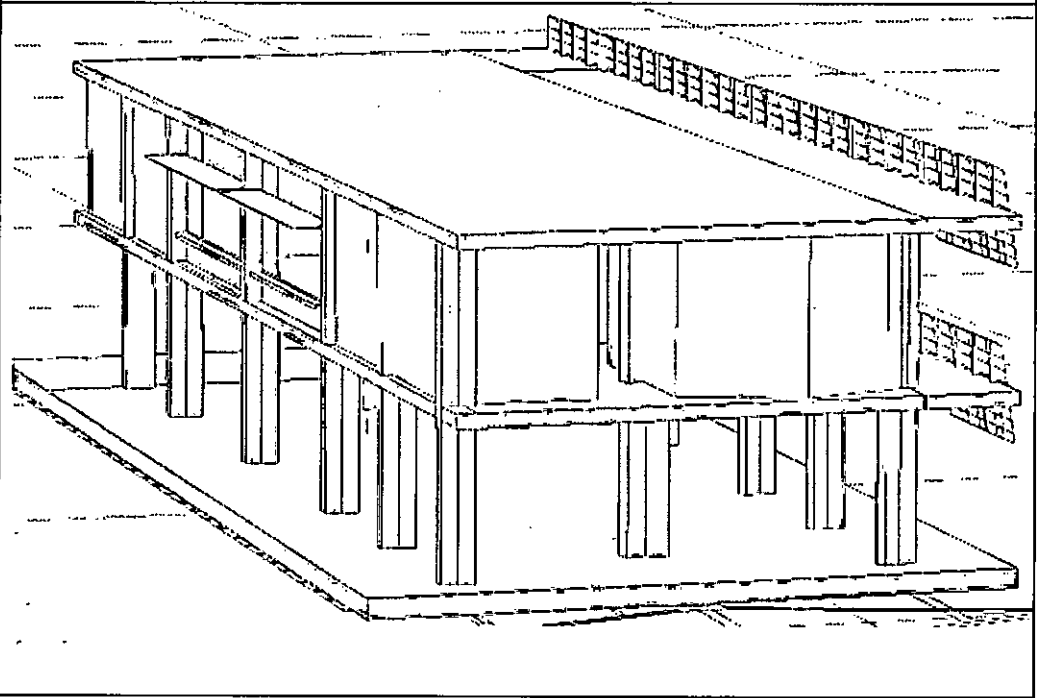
(d): Case 20: light shelf at 2.5 m (north opening)
